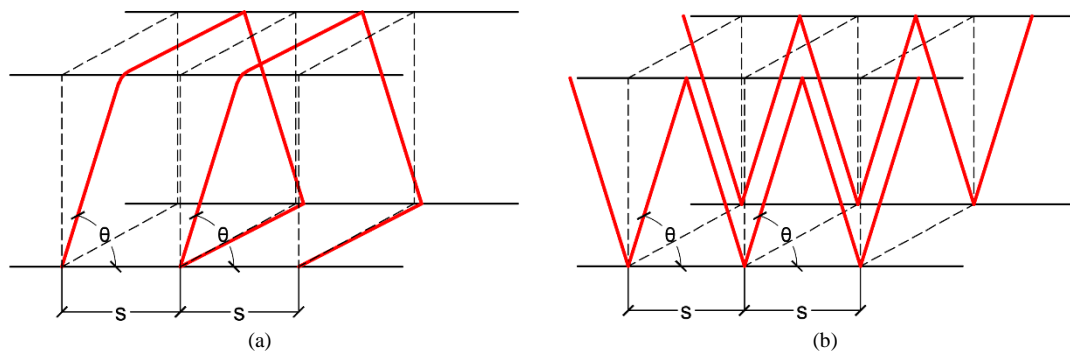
(a) Continuous Spiral and (b) Truss Reinforcement System [6]
